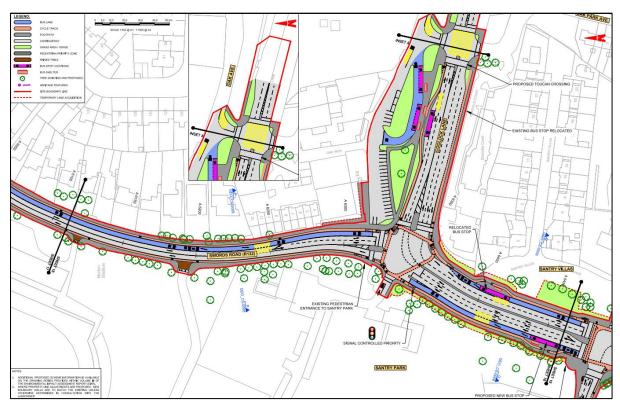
Extract of the Proposed Scheme General Arrangement Drawings (Sheet 18)
